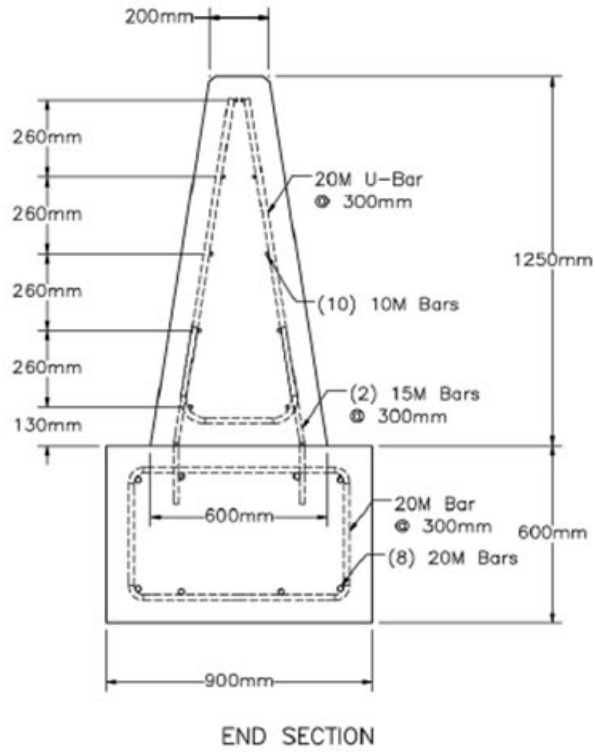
Previous TL-5 foundation design layout for median barriers [5]
